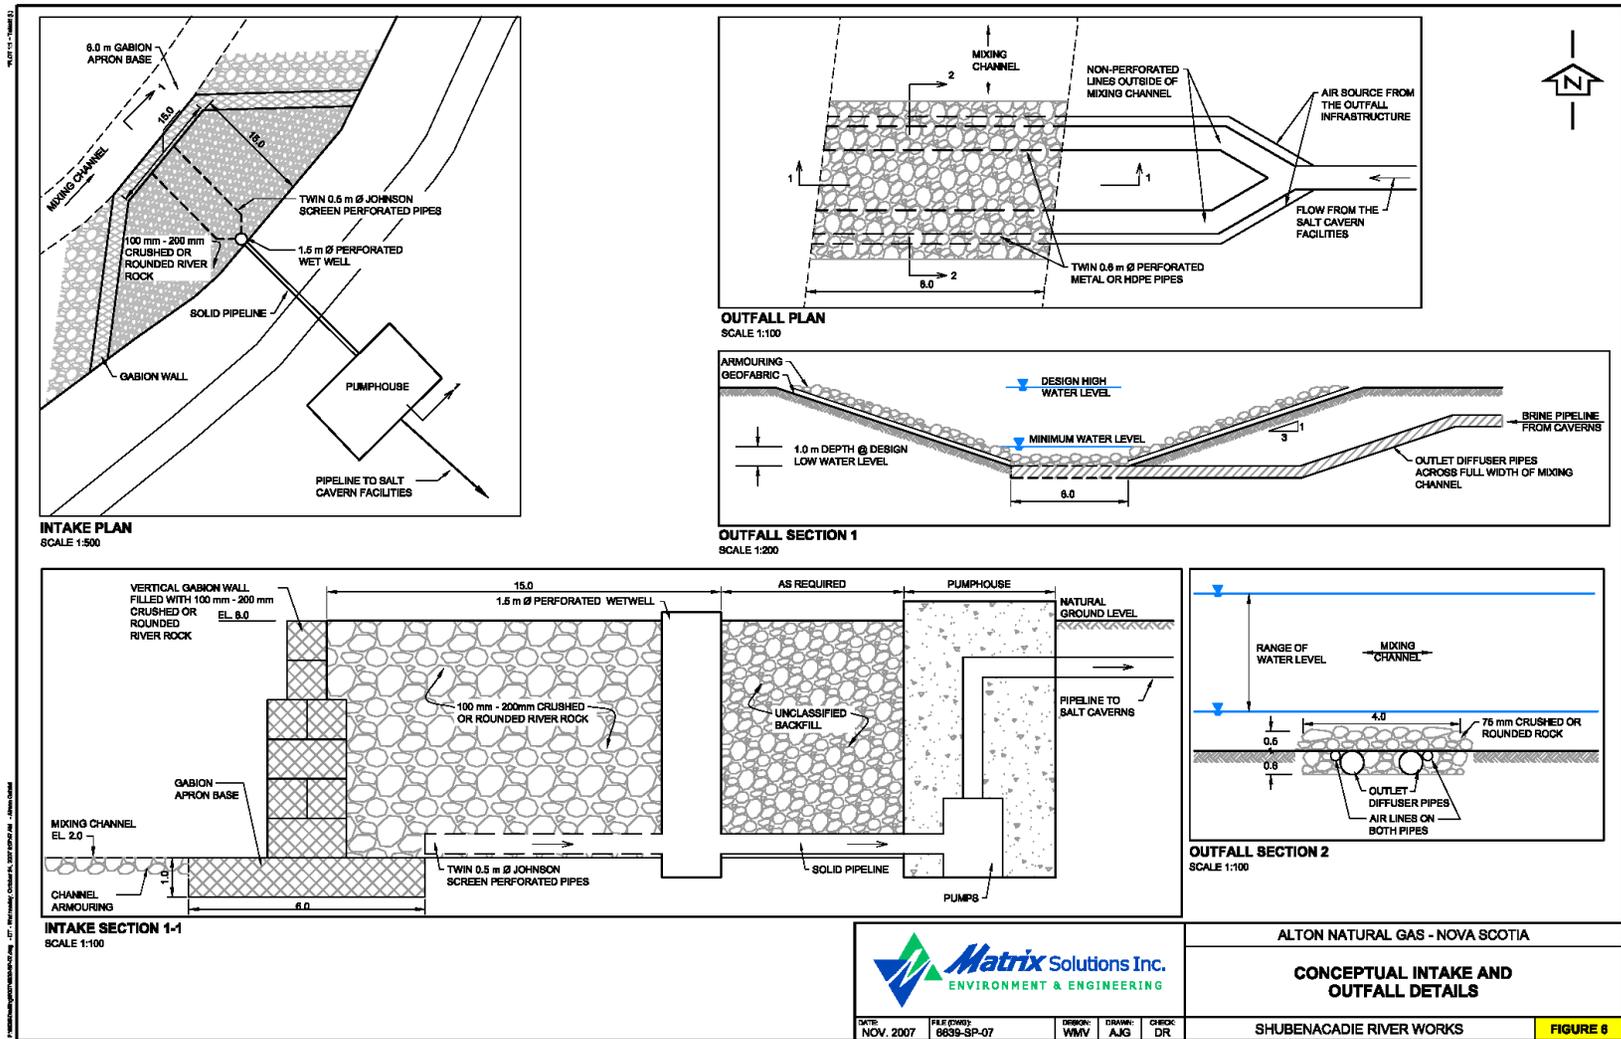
Details of the design of the gabion wall, wet well, water intake line, and brine outfall design.
